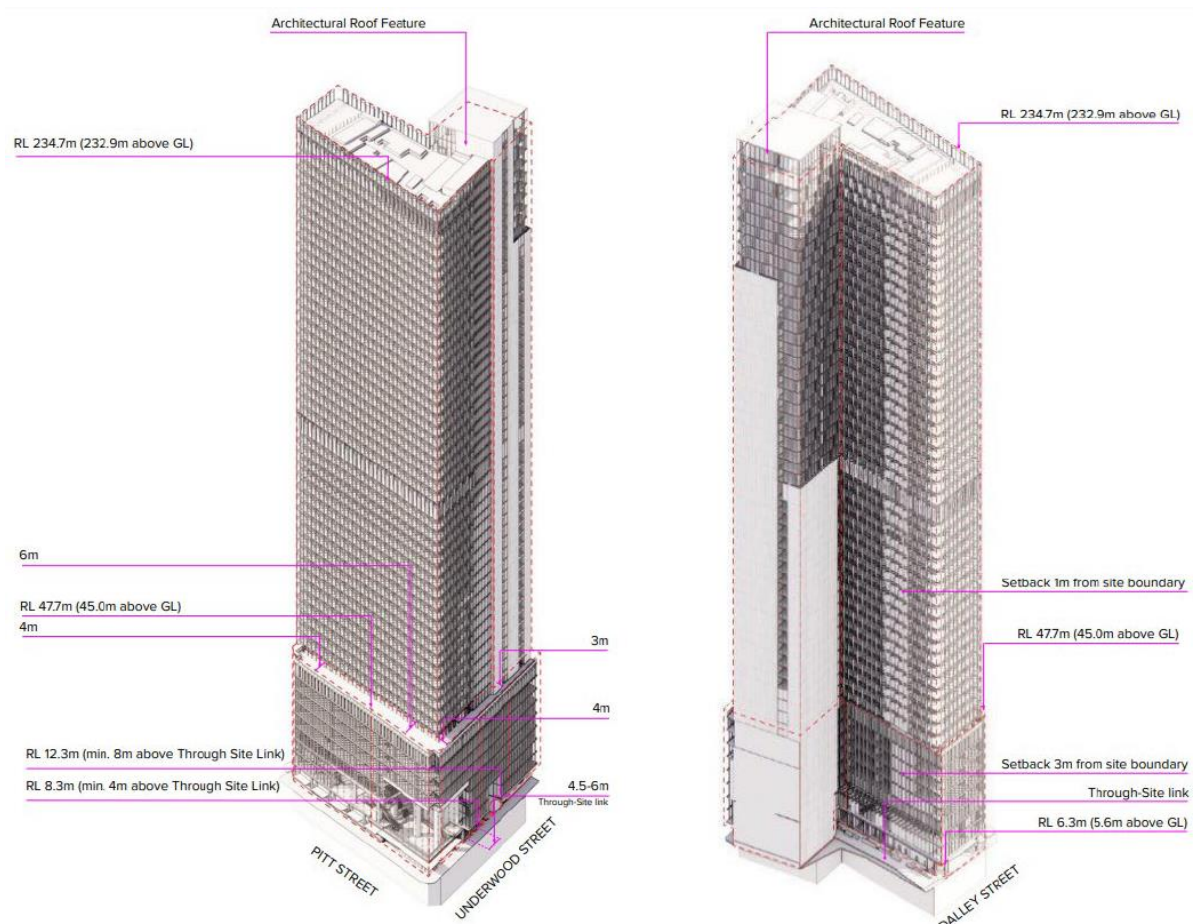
Proposed building tower height, podium height, setbacks and through site link dimensions
